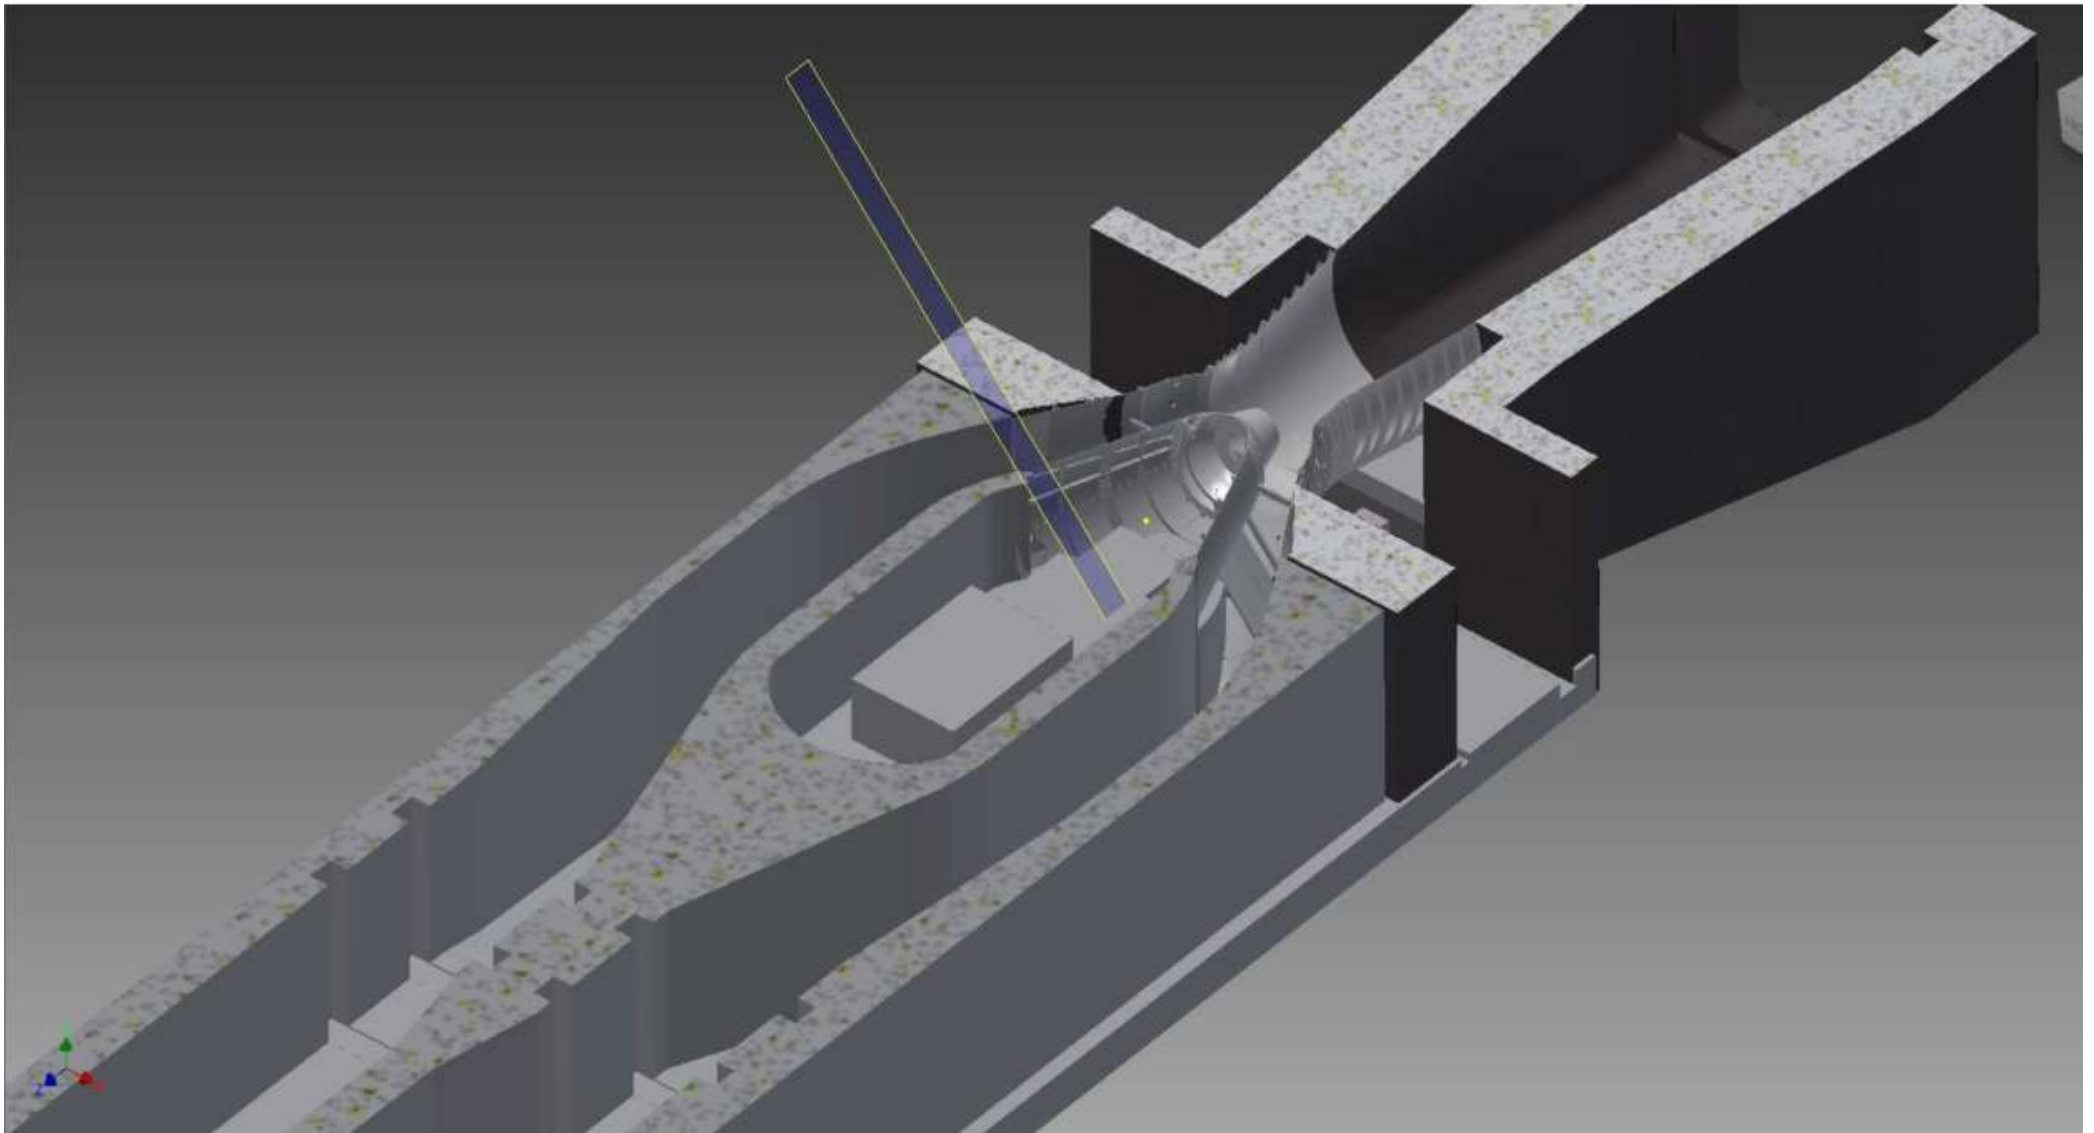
Pit Type HFK Front View at Runner Chamber End
